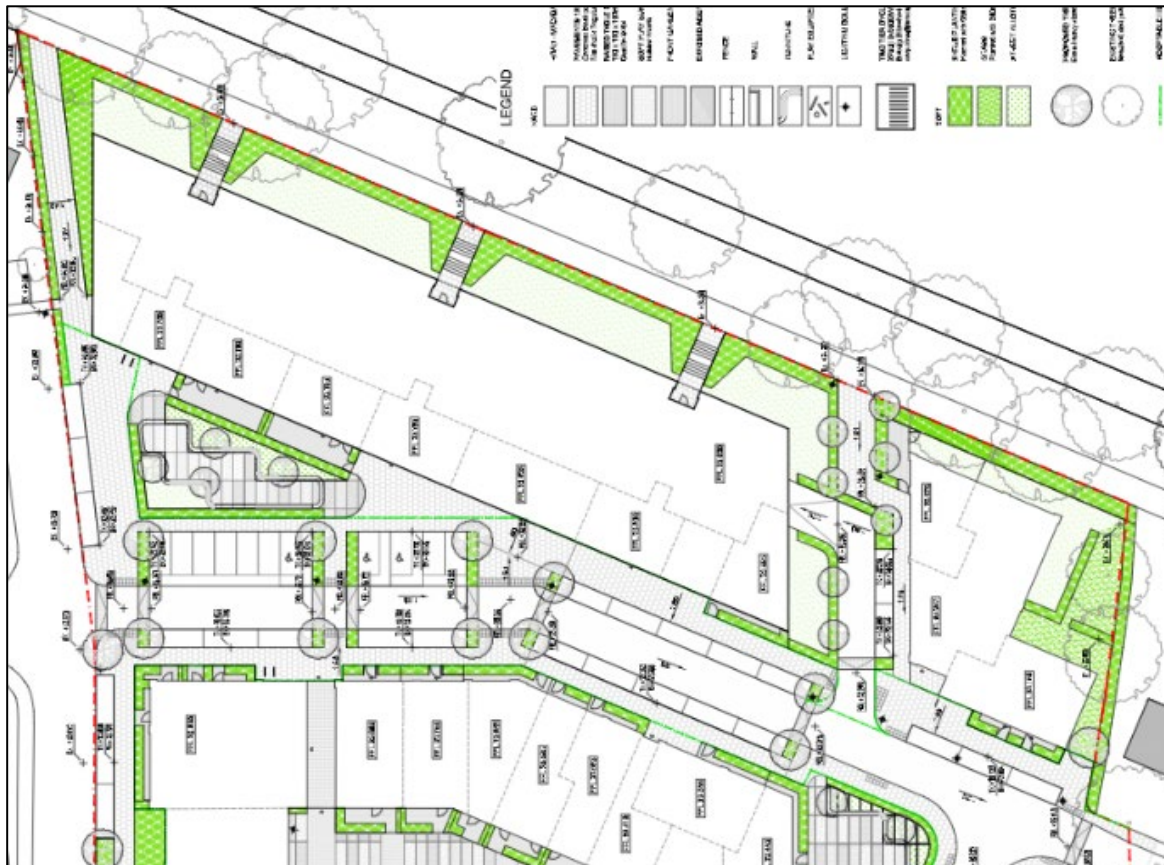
Landscape Plan for Phase 3 under Planning Permission ref: P/2014/6383
